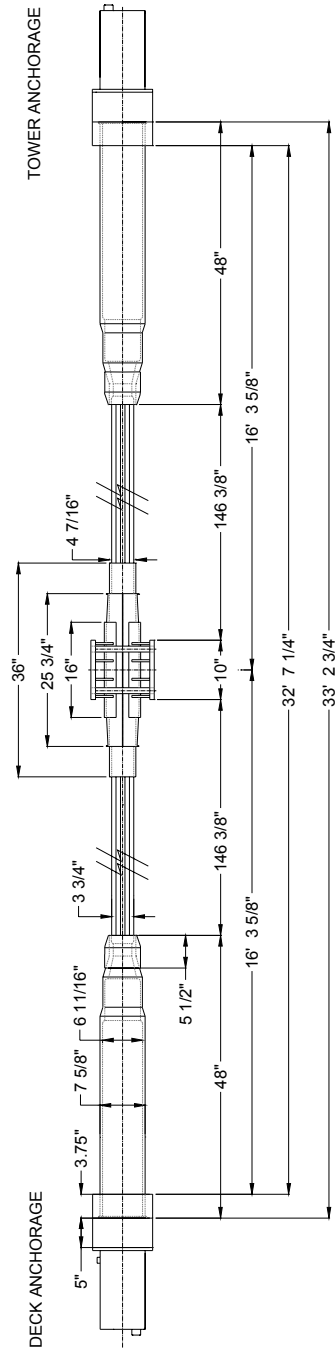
Longitudinal geometry of ungrouted test specimen
